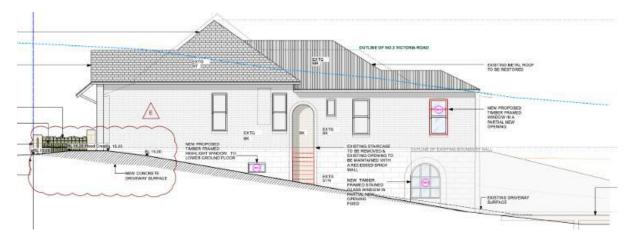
Proposed north-east (side) elevation – Dwelling 1 (ground floor) and Dwelling 3 (lower ground floor)
